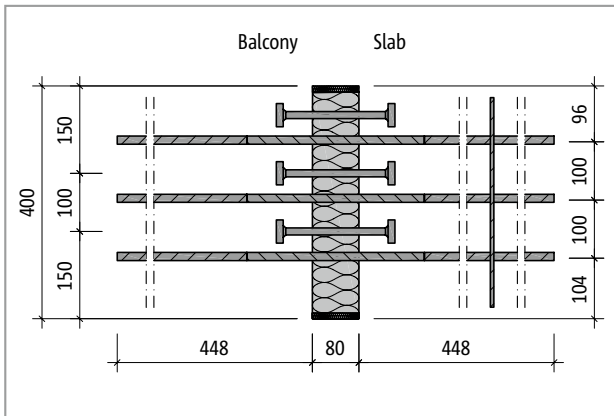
Schöck Isokorb® T type Q-P-V9: Product layout
